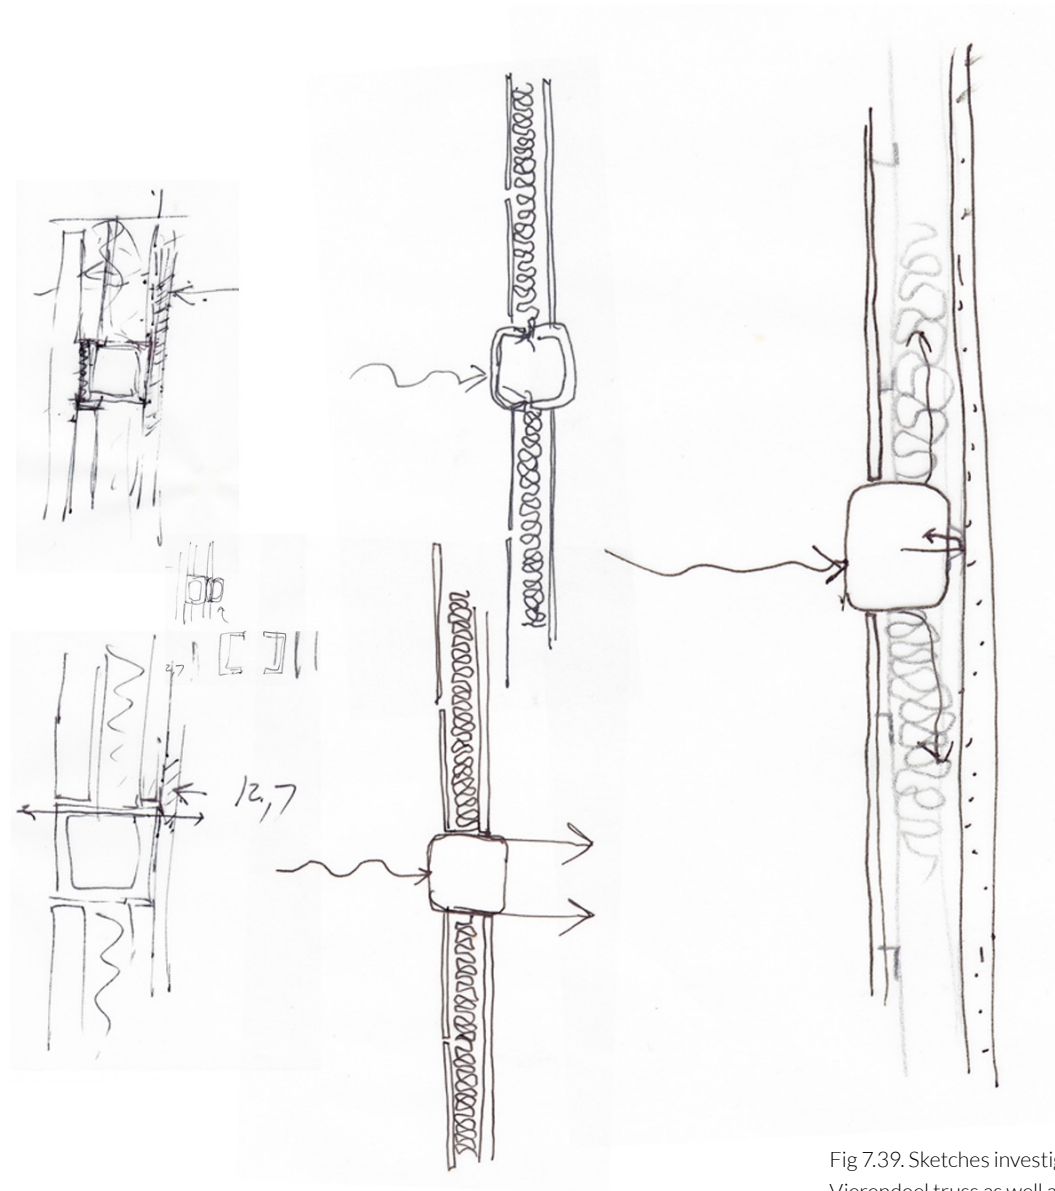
Sketches investigating revealing and concealing the Vierendeel truss as well as looking at thermal breaks (Author, September 2016).
